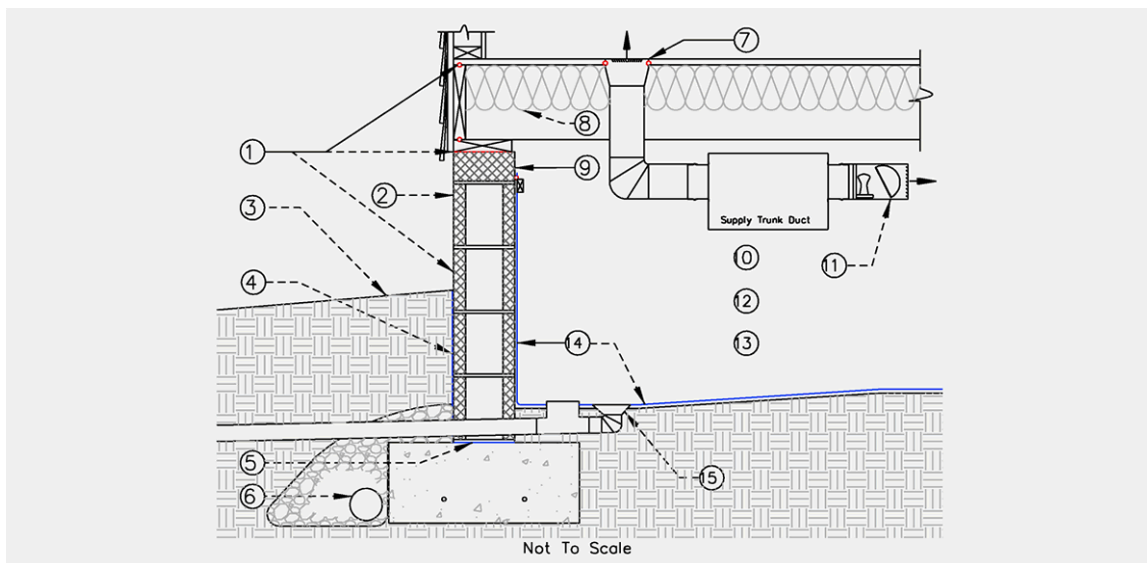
Vented crawlspace with insulated floor. Vented crawl space does not have supply duct coming out of duct trunk line as shown in the figure.
